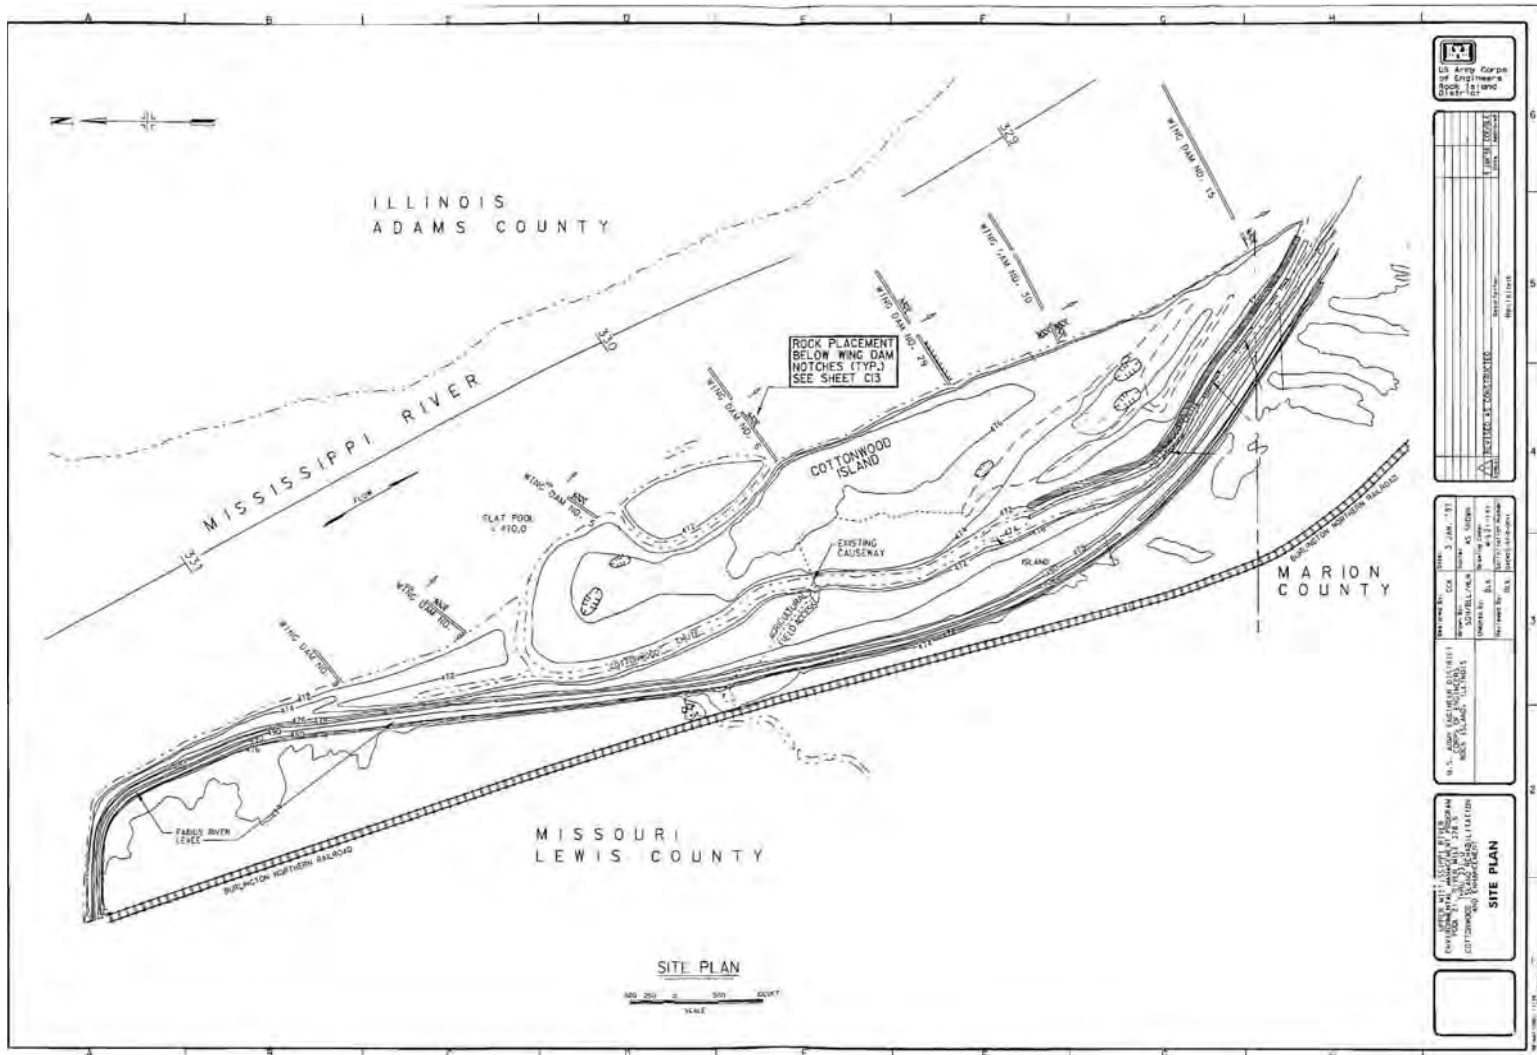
Cottonwood Island HREP; Wing Dam Notch Site Plan
